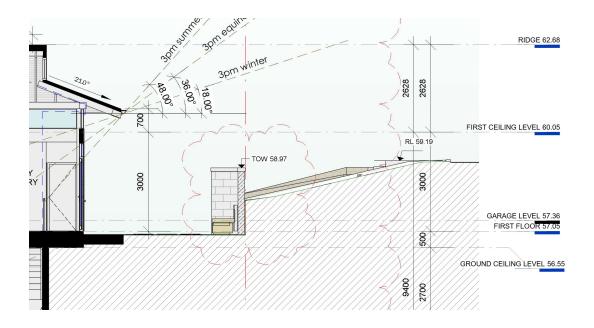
Boundary stone fence Raised to act as balustrade. Existing stone walls remain and will provide landscaping as per council specification.
